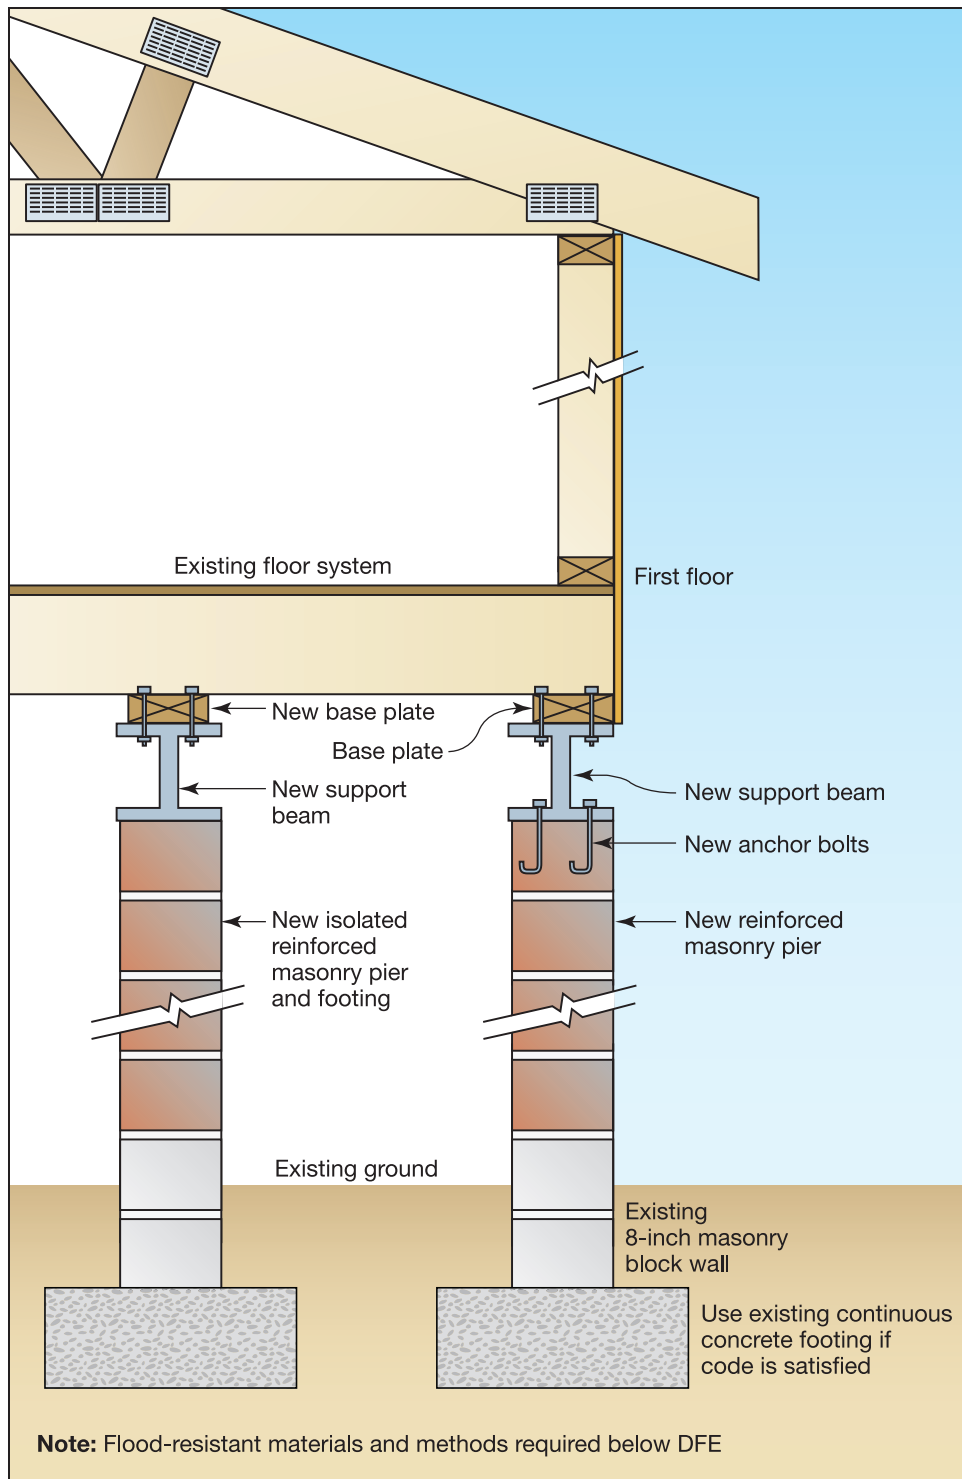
E-8. Cross-section of elevated wood-frame house on new or extended pier foundation
